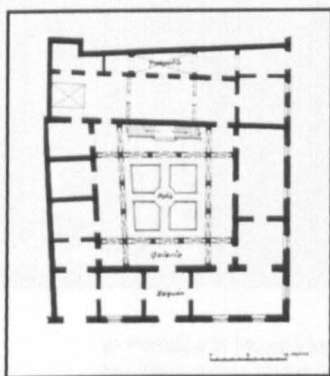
Floor Plan- 18<sup>th</sup> Century House
